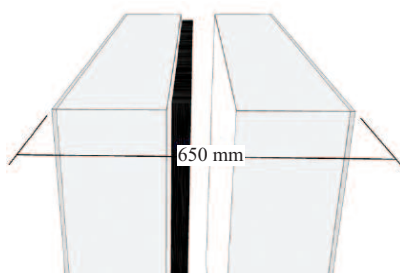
Wall construction modelled in Insul software – added wool in the cavity
